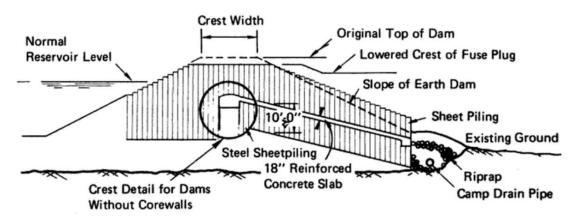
A typical cross-section of fuse plug spillway in an existing dam embankment [13]
